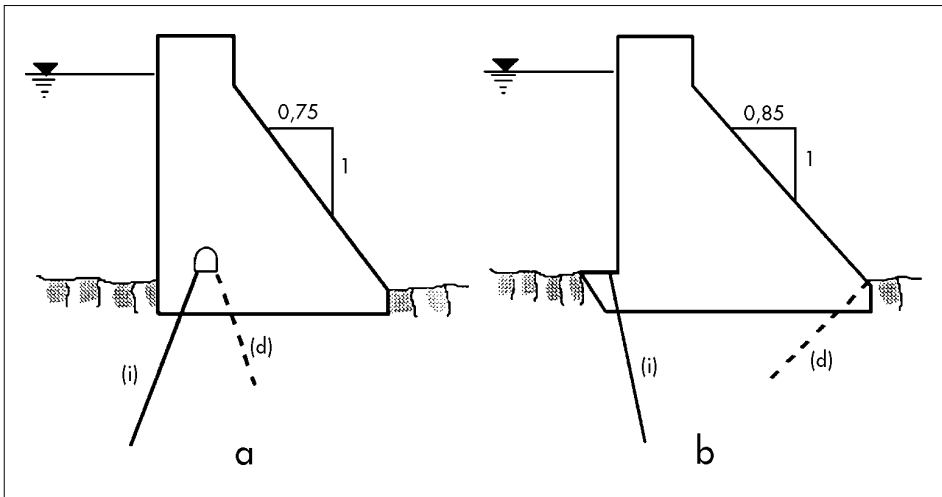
Layout of the grout curtain (i) and the drainage curtain (d): a - with gallery; b - without gallery
